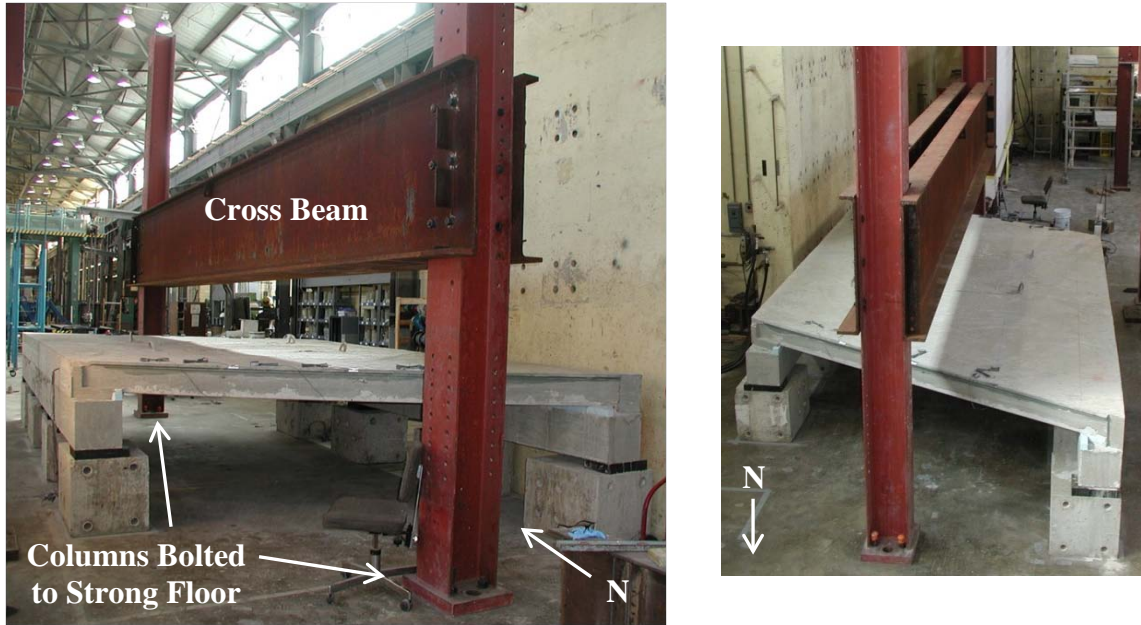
Load Frame for Static Loading of Specimen P30P3
